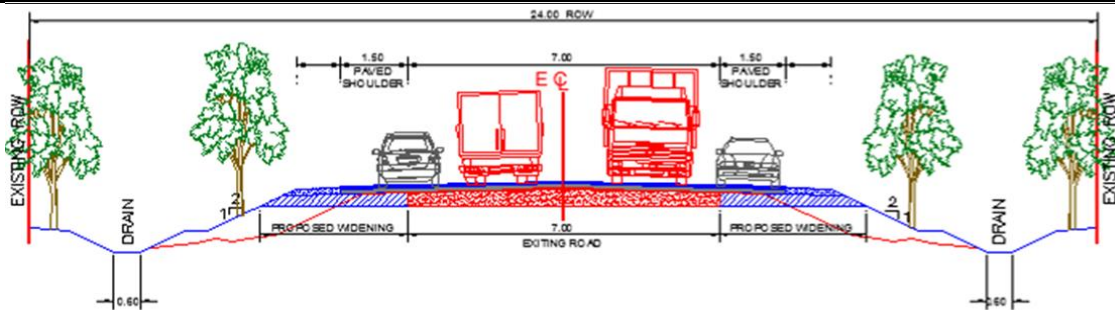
Typical Rural Cross Section for 2 Lanes with Hard Shoulder (2L+HS) Option
